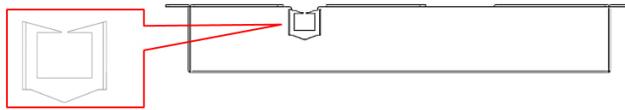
Refrigerant Piping Installation between Indoor and Outdoor Units)
